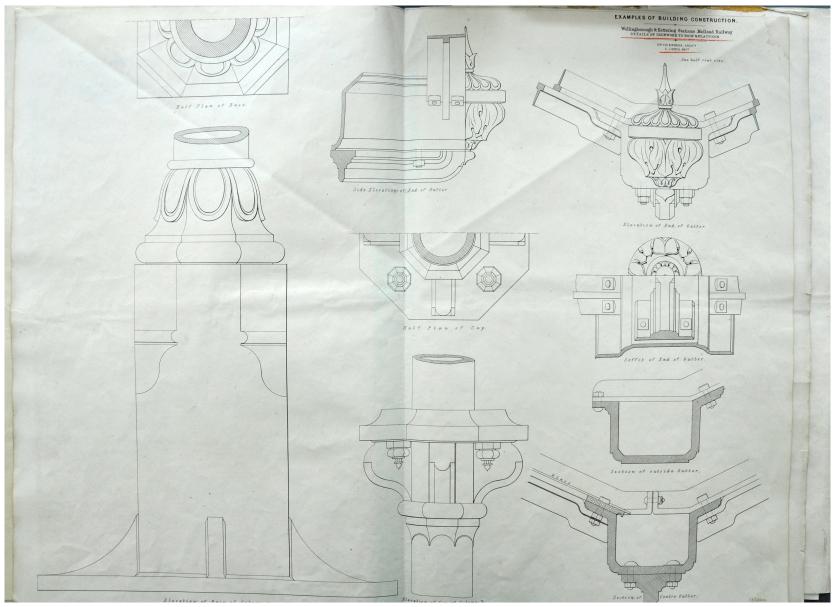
Detailed drawings of the 1857 canopy signed by Driver and reproduced in Henry Laxton's Examples of Building Construction in 1858
